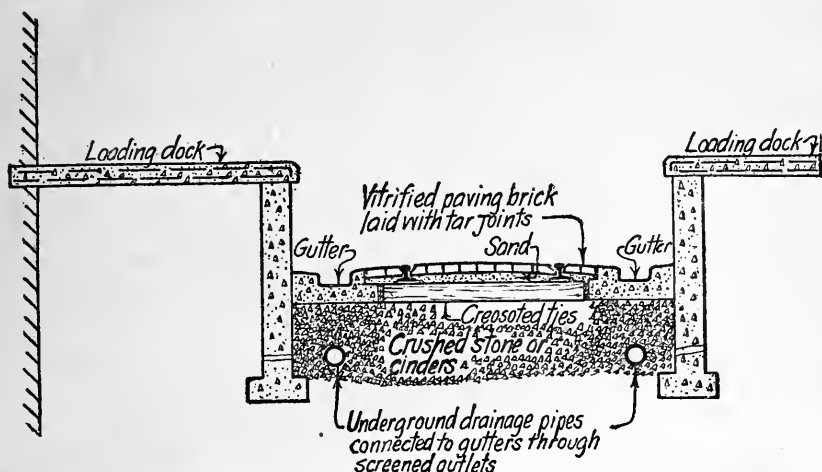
Railroad loading track and dock with closed side, vitrified-brick surfacing laid with tar joints, and concrete gutters.
